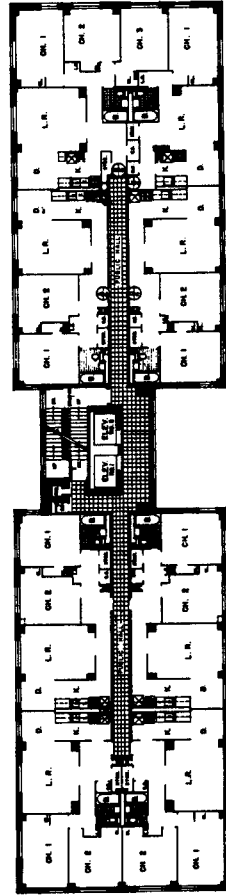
Floor Plan of Van Dyke Houses. Floor plan shows the location of elevator and scissors fire stairs with respect to the individual apartments on a typical floor in Van Dyke high-rise buildings. This separation occurs on all floors.
